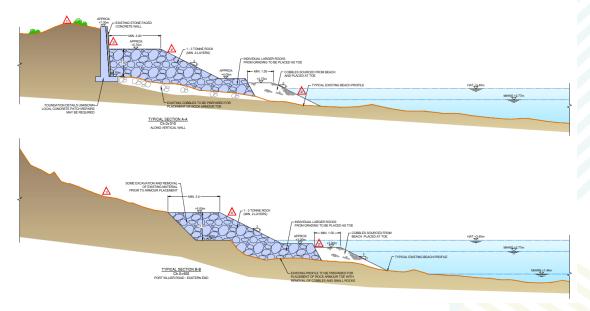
Cross-section of proposed works at Porth Killier (HR Wallingford 2022)
